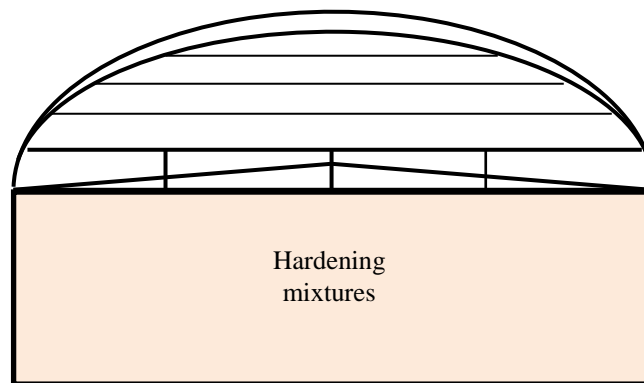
The layout of roof support with hardening mixtures to support the ore-hosting layer
